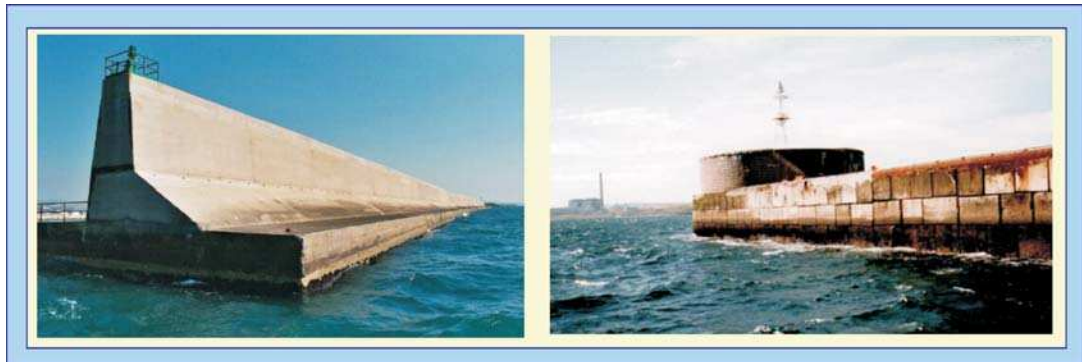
Examples of vertical breakwaters: (left) modern concrete caisson and (right) older structure constructed from concrete blocks
